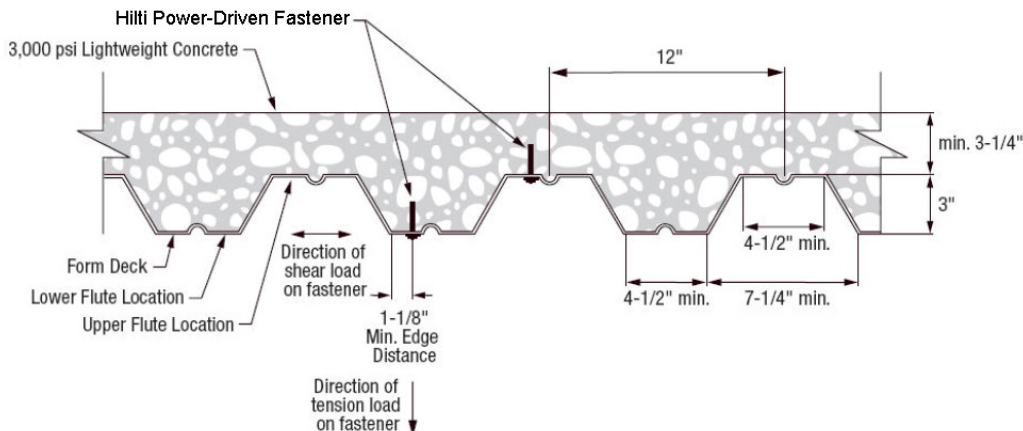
HILTI FASTENER LOCATION IN 3-INCH-DEEP COMPOSITE FLOOR DECK, NORMAL DECK PROFILE ORIENTATION
